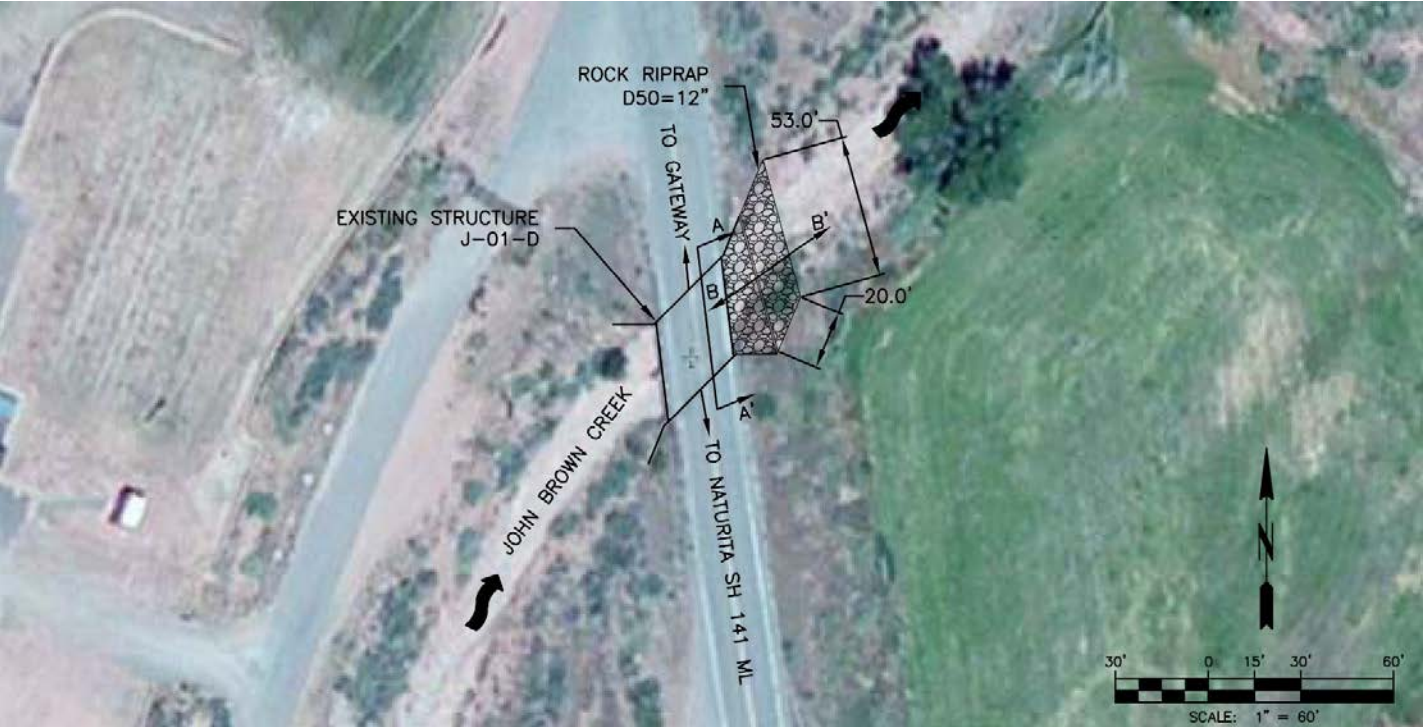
Plan view of Bridge J-01-D with recommended hydraulic scour countermeasure location
